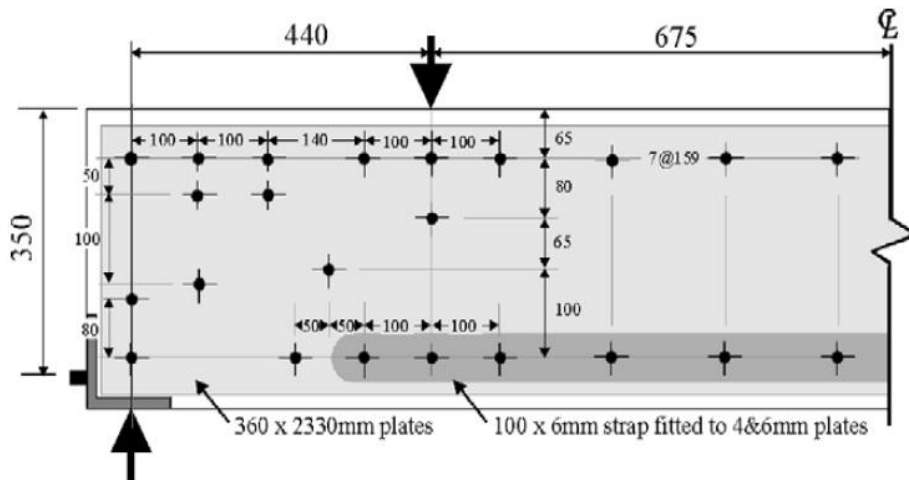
Bolted Steel Plates Deep Beam Detailing (Barnes, et al., 2001).
